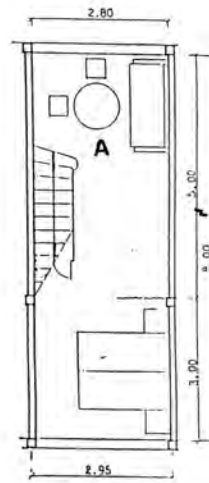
COLLECTIVE HOUSE, LITVÍNŮV, LIVING ROOM IN THE THREE-ROOM, TWO-STORY UNIT.
